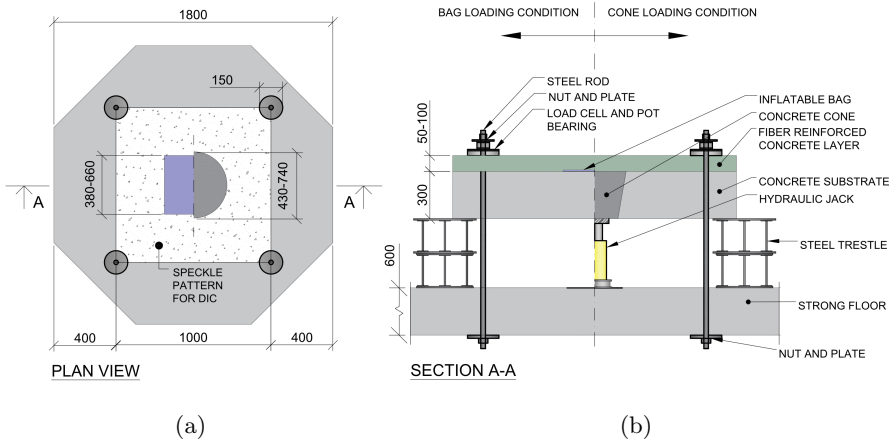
Geometry and layout of experimental specimens. a) Plan view of the specimen with right side for cone loading condition and left side for bag loading condition b) Cross-section of the specimens. The right half shows the geometry for the cone loading condition and the left half shows the bag loading condition. All measurements in mm.
